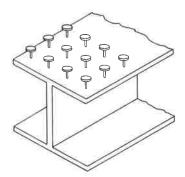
Array of steel studs welded to girder flange (10).
